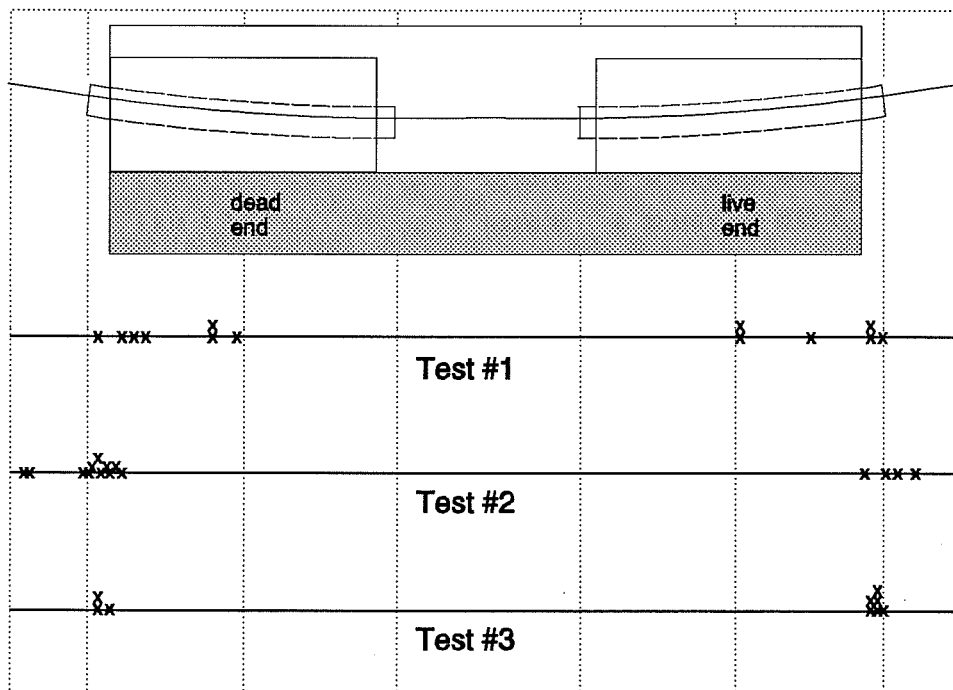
Schematic drawing of the wire fracture locations in each test.
